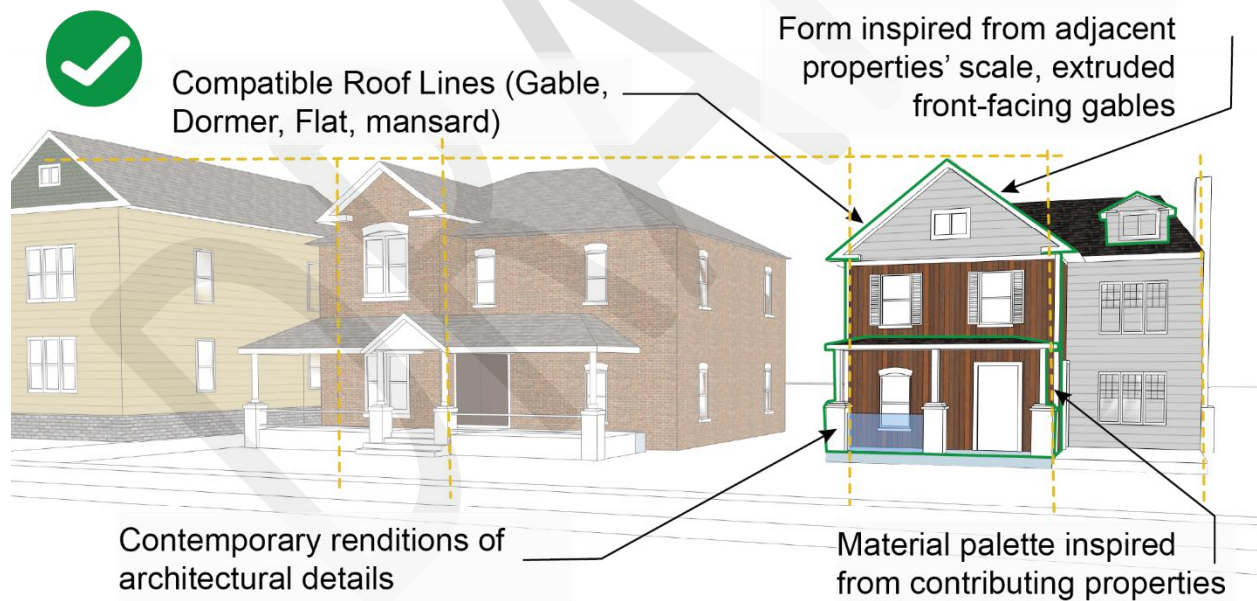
Graphic example of new construction within the District, using form, scale and architectural details as inspiration for new buildings.
